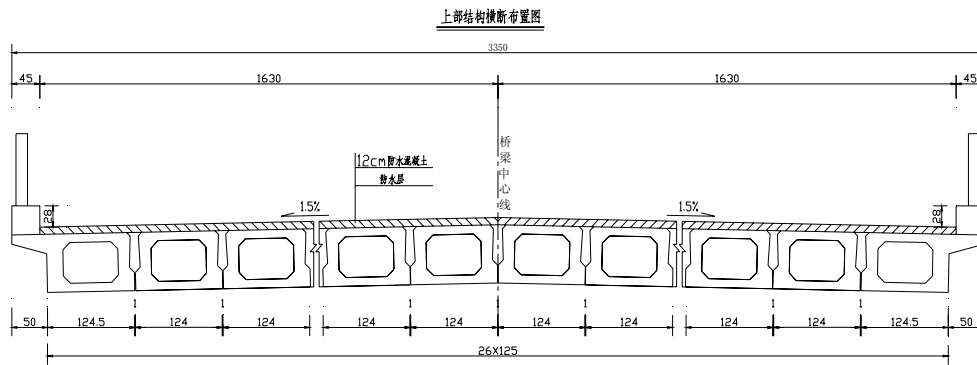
Cross section of Hong Yu Medium Bridge (unit: cm)
